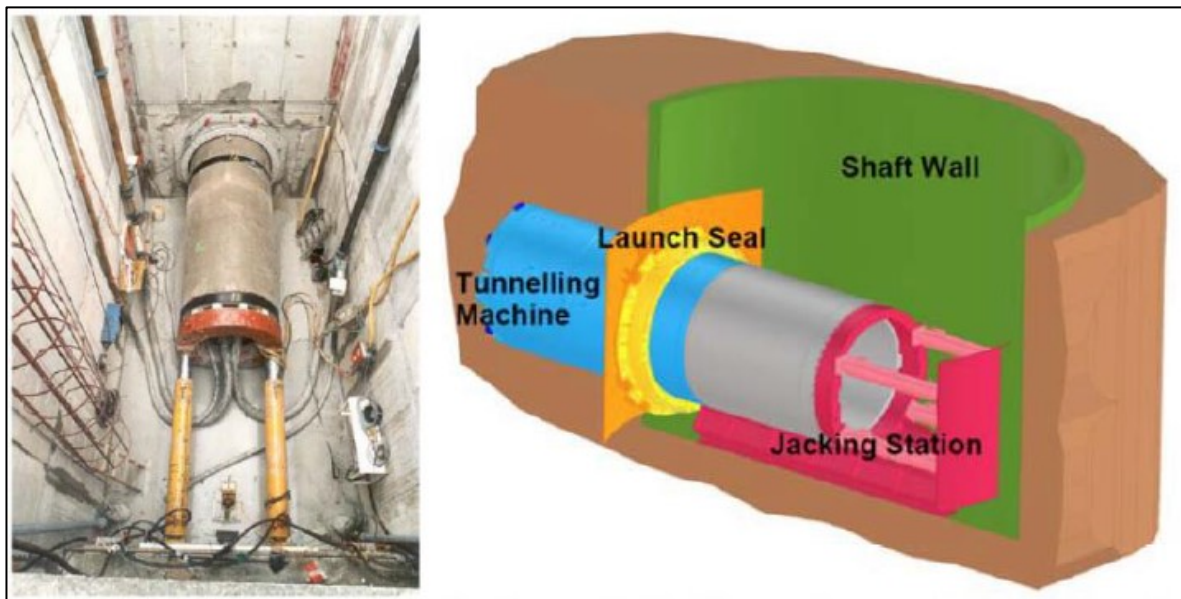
Example of thrust shaft and pipe jacking system for constructing pipeline tunnels (PRDW, 2016).
